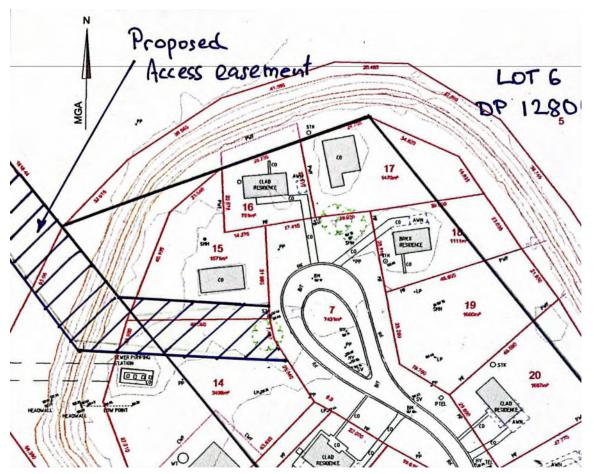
Proposed easement for potential future access to Wimbledon/Mission Road
